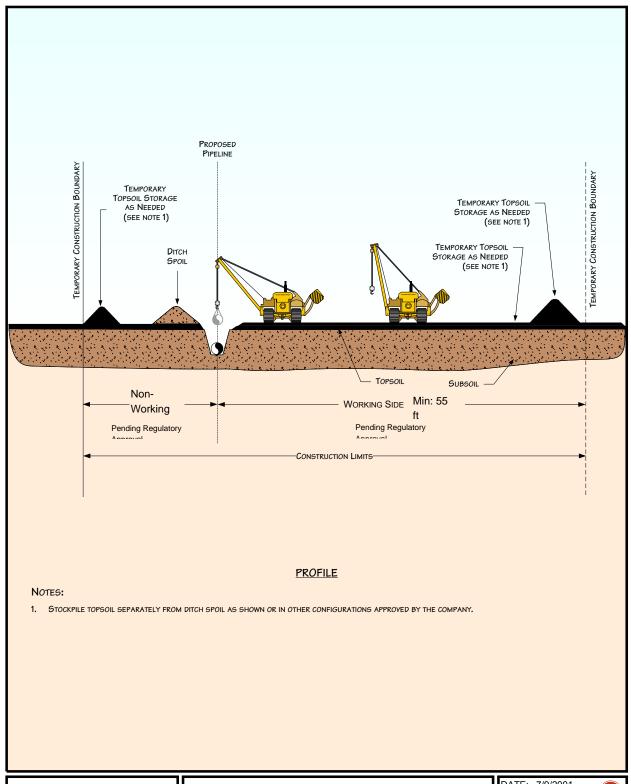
Environmental Protection Plan Typical Topsoil Segregation – Trench Line Only
